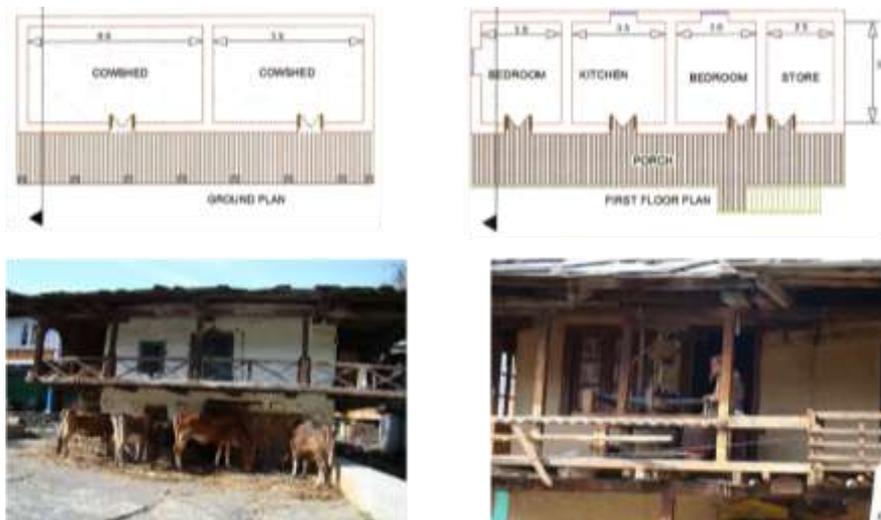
Functional plan of a building (a) Ground Floor (b) First Floor (c) Cattles on Ground Floor & (d) habitable rooms on the first floor with Sunspaces (Verandah) - for yarnning by using “khaddi”
